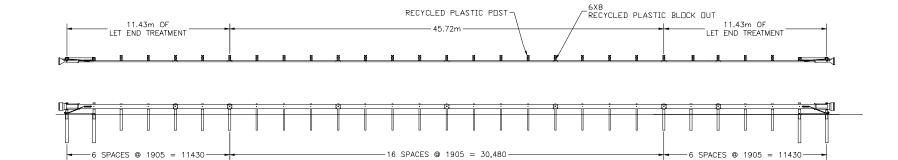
Layout of the Plastic Post W-Beam Guardrail Installation for Test 414588-1.
